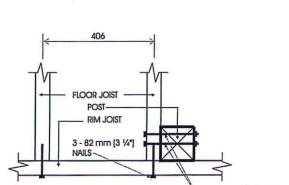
Exterior Connection: Post Bolted to Floor Joist - 8 mm (5/16") Bolts
